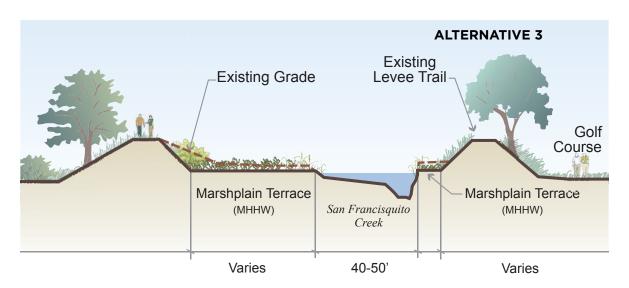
| CROSS SECTION D, VIEW LOOKING DOWNTREAM
